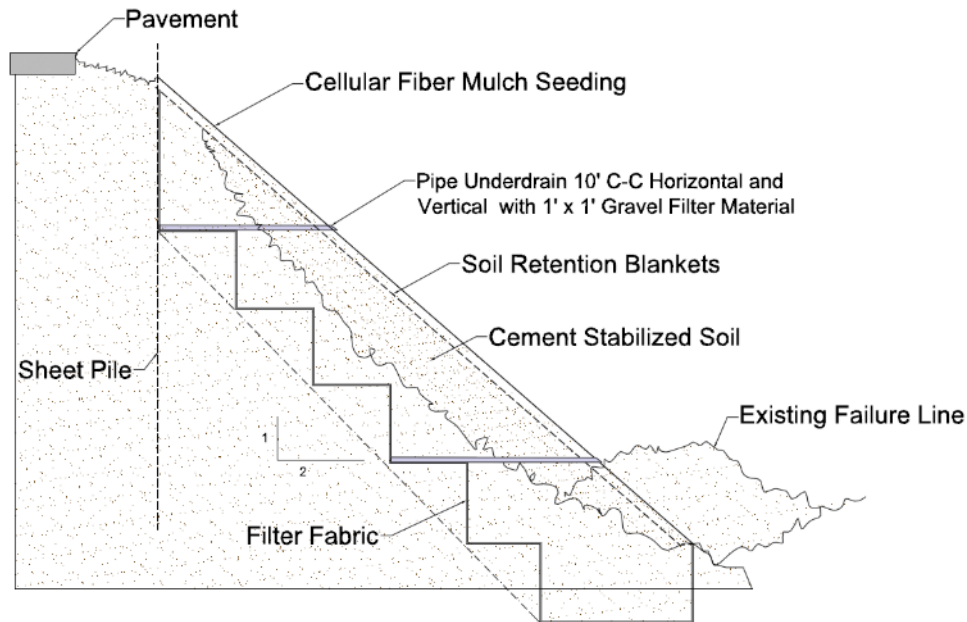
Slope repair using temporary shoring, benching, filter fabric, cement stabilization, cellular fiber mulch seeding, soil retention blankets, and an underdrain pipe system
